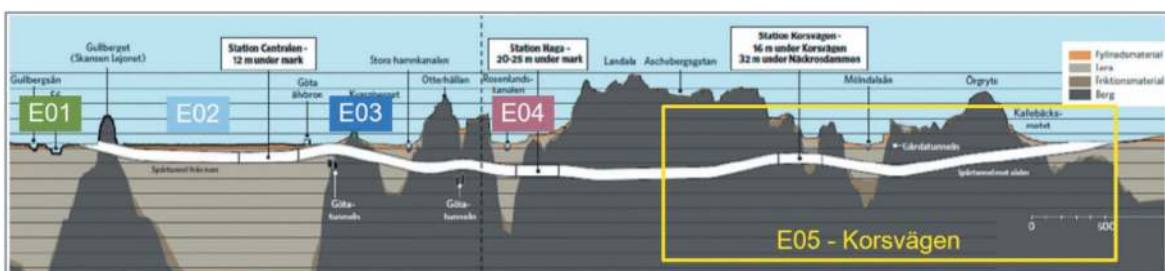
Simplified geotechnical longitudinal section of Gothenburg West Link.
